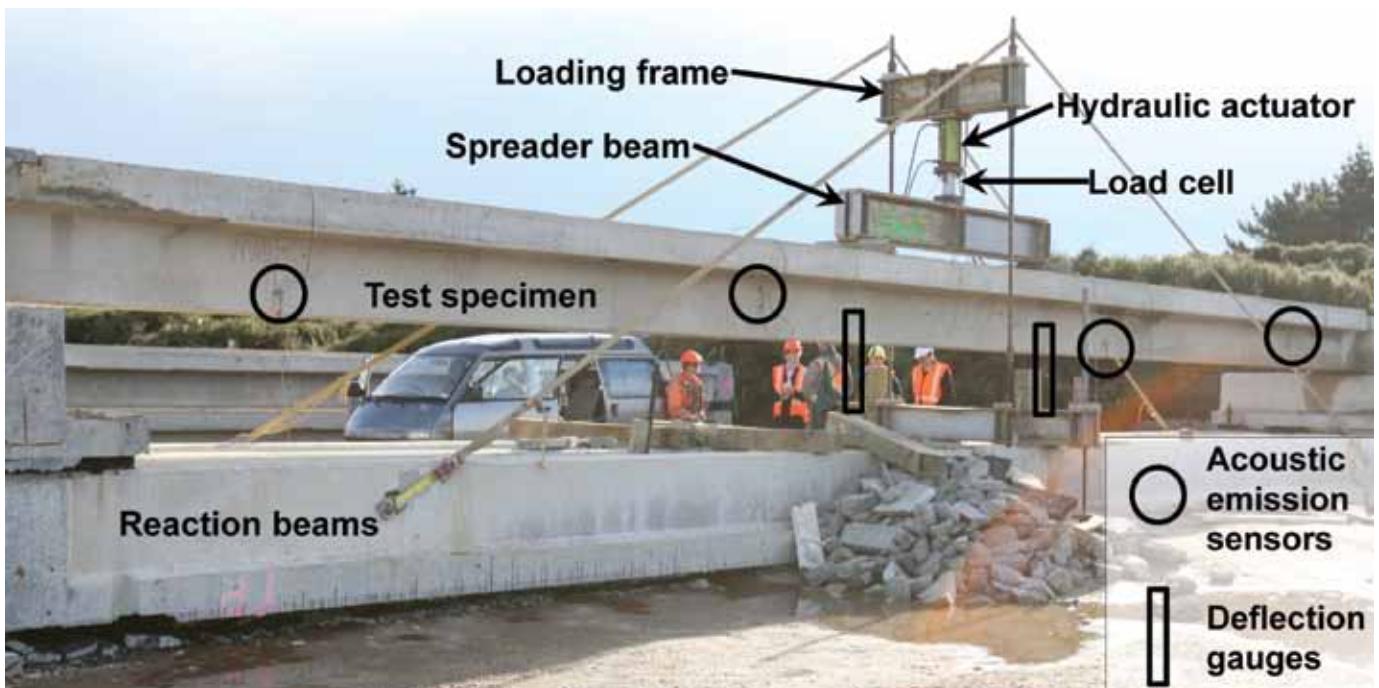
Self-reacting loading frame and instrumentation for destructive testing.
